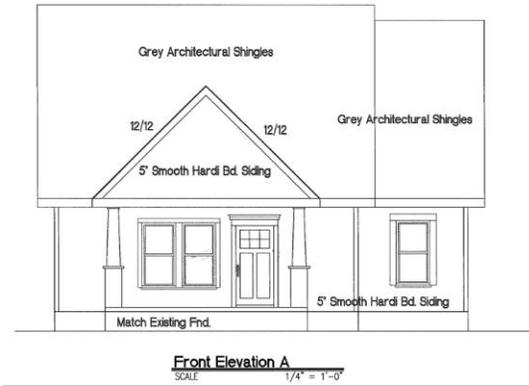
Discrepancies between the existing front façade compared to the elevation submitted
